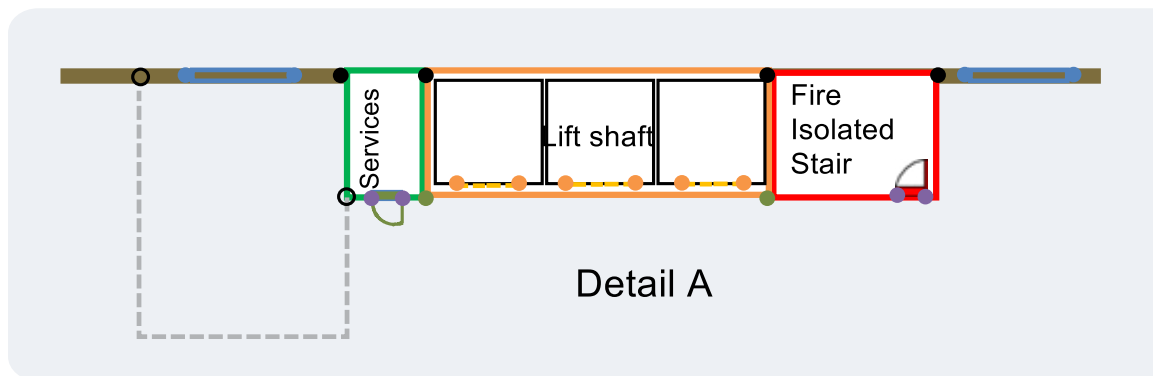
Floor plan section of a commercial building core showing cavity barriers around shafts, windows in external walls and interfaces with non-fire resistant walls
